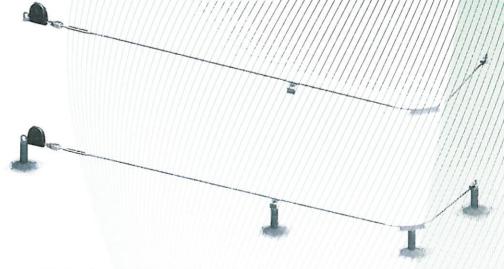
Typical layout of the anchor device type: Altiligne, without and with supports
